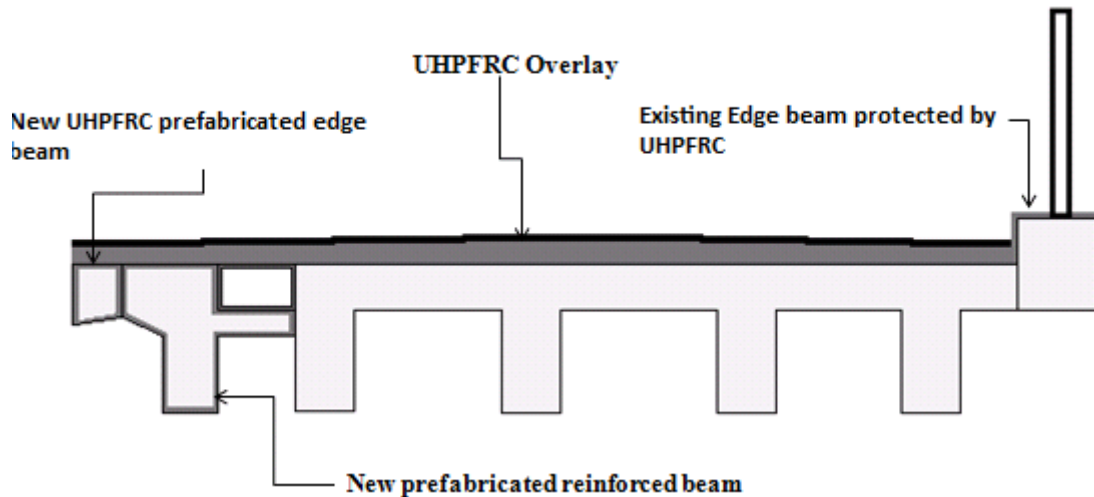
Cross Section of Bridge after rehabilitation with UHPFRC. Adapted from Denarié (2005).
